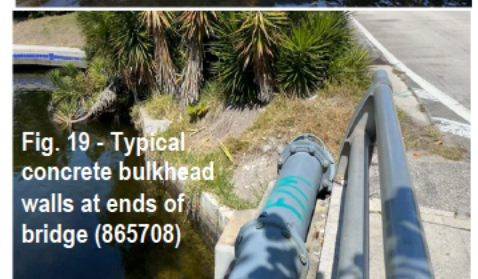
Typical concrete bulkhead walls at ends of bridge (865708)
